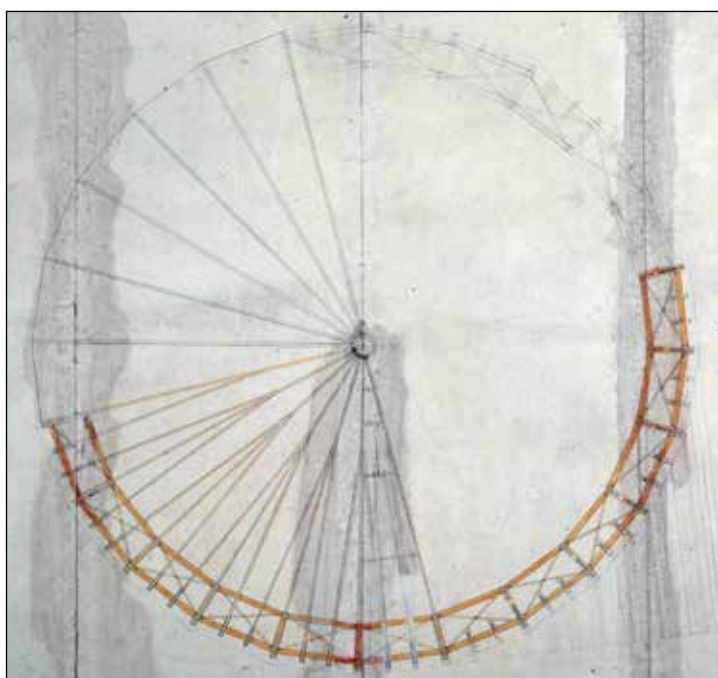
Roof plan of Nash's 'tent room' (Rotunda) at Carlton House, May 1814. (The National Archives, ref. WORK 43/574; colour-adjusted)
